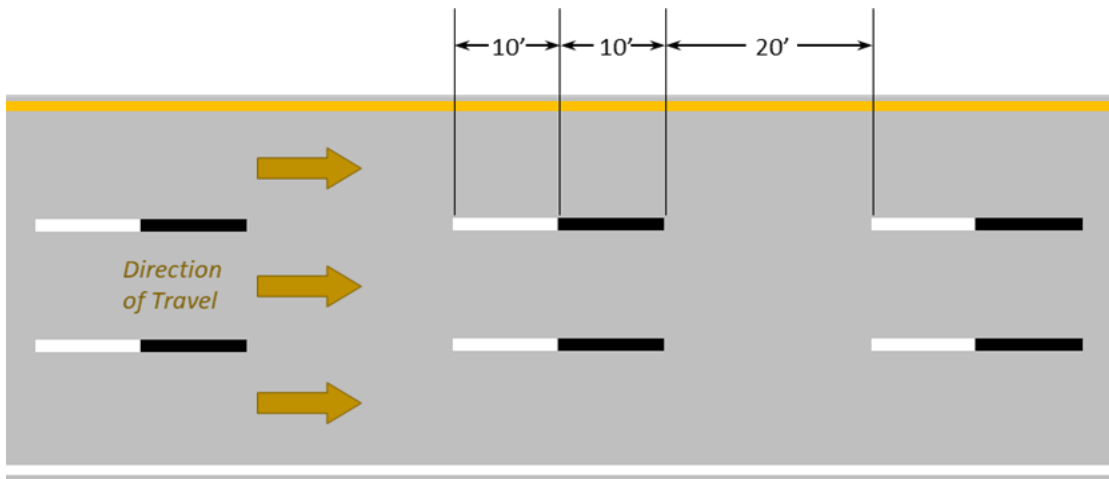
CPM-5: Contrast Pavement and Shadow Marking Multi-Lanes
